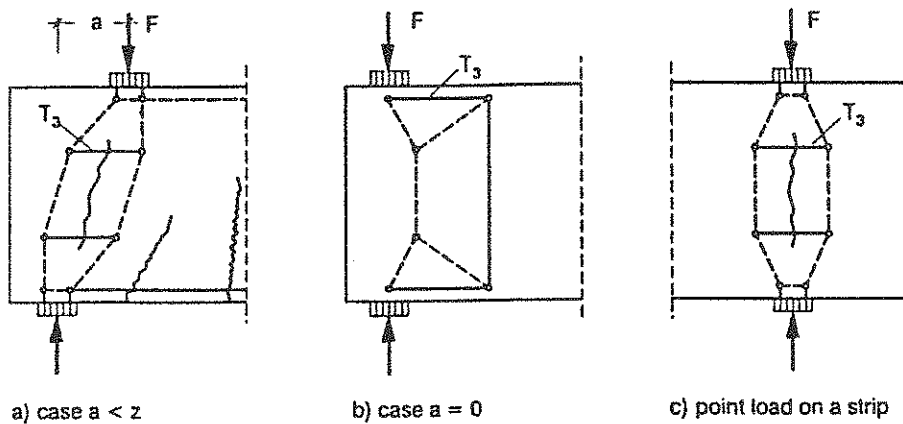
Models for the horizontal reinforcements for loads near or over a support
